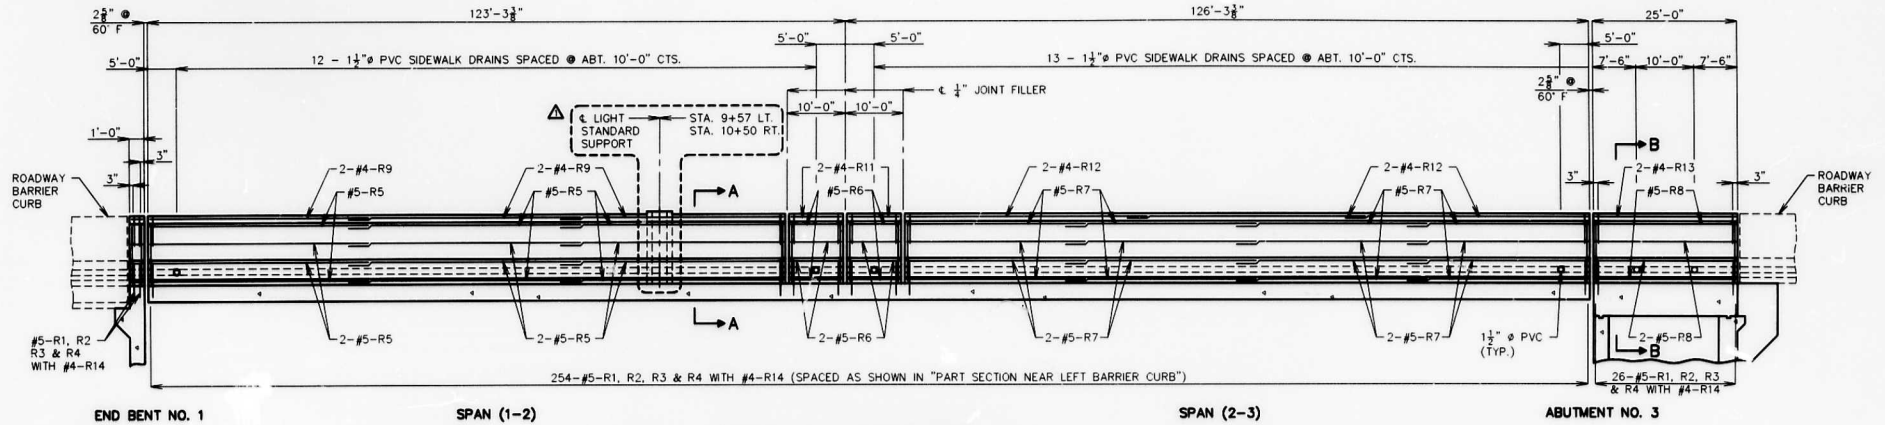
DETAILS OF CONDUIT SYSTEM ON STRUCTURE
